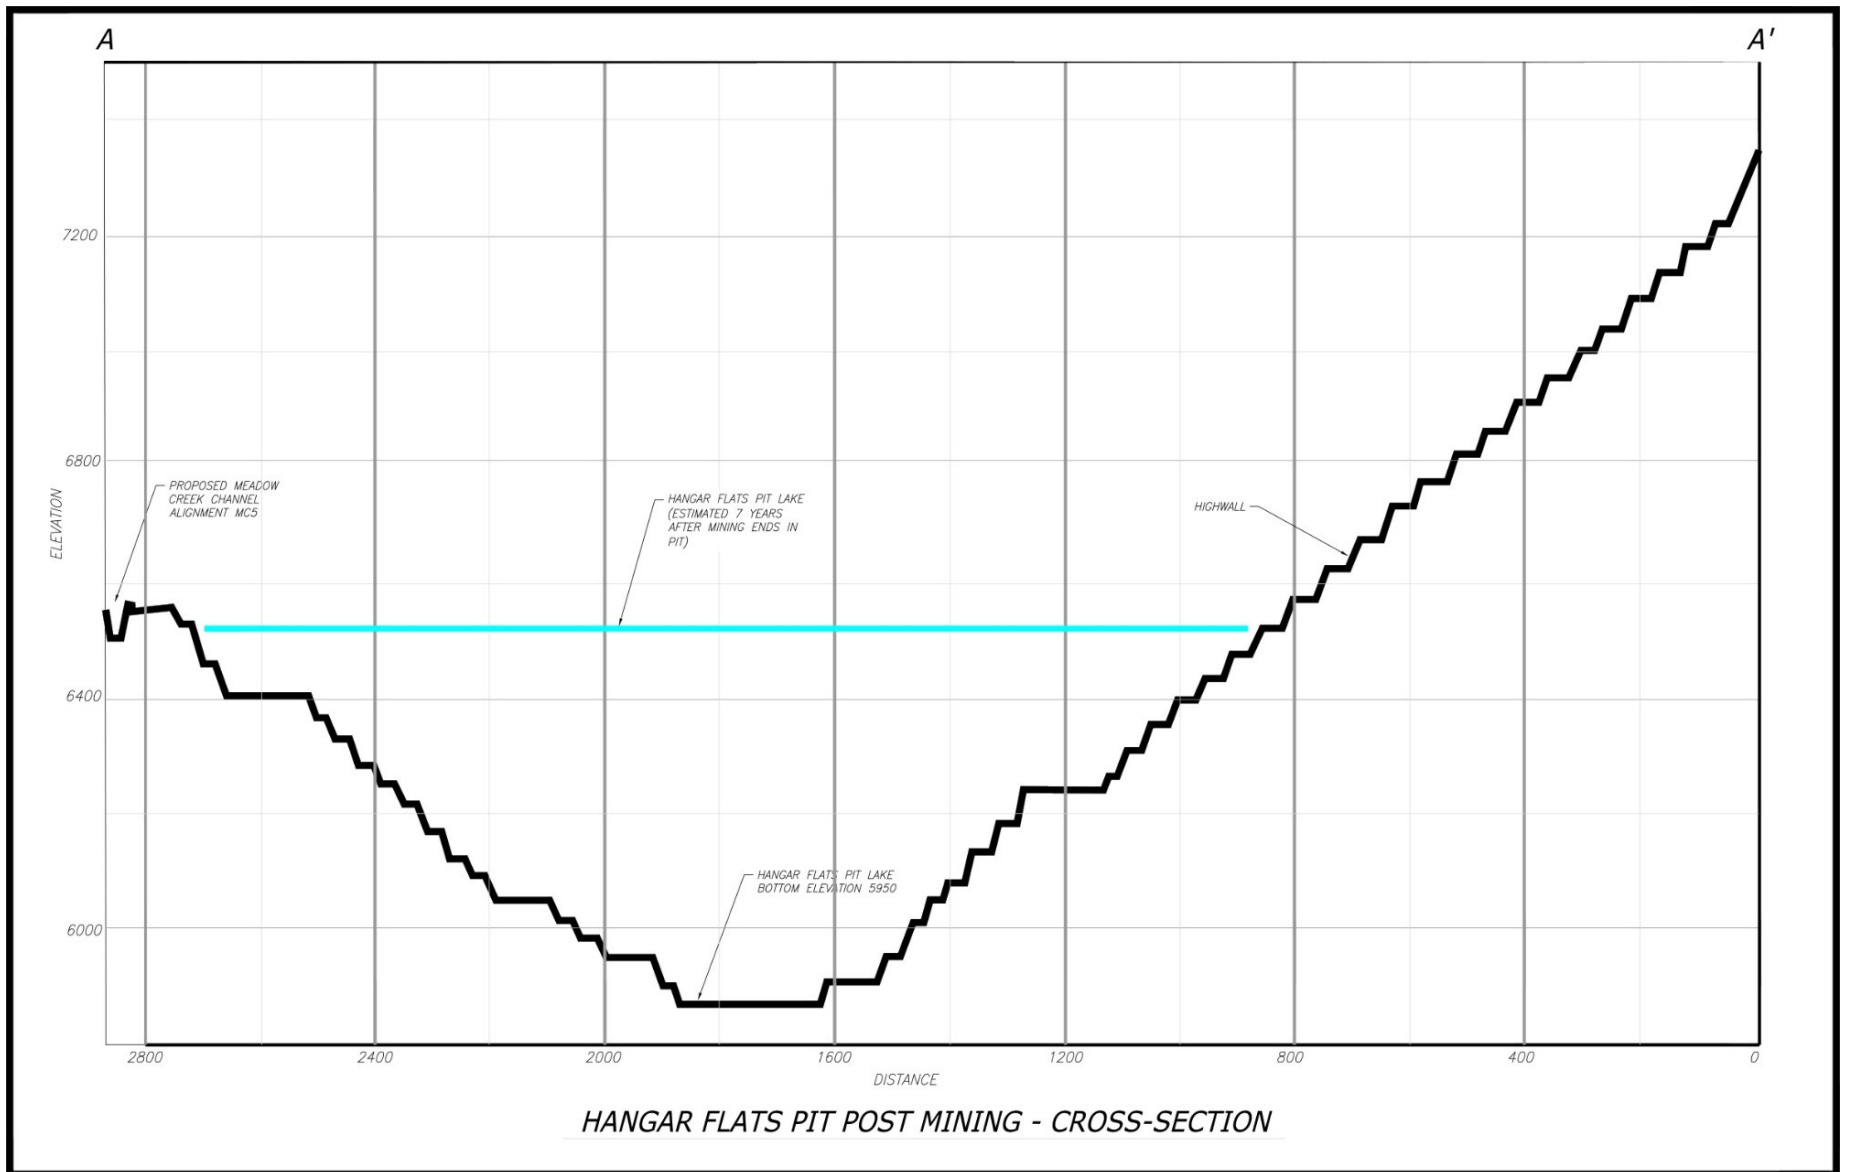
Hangar Flats pit post mining – Cross-Section
